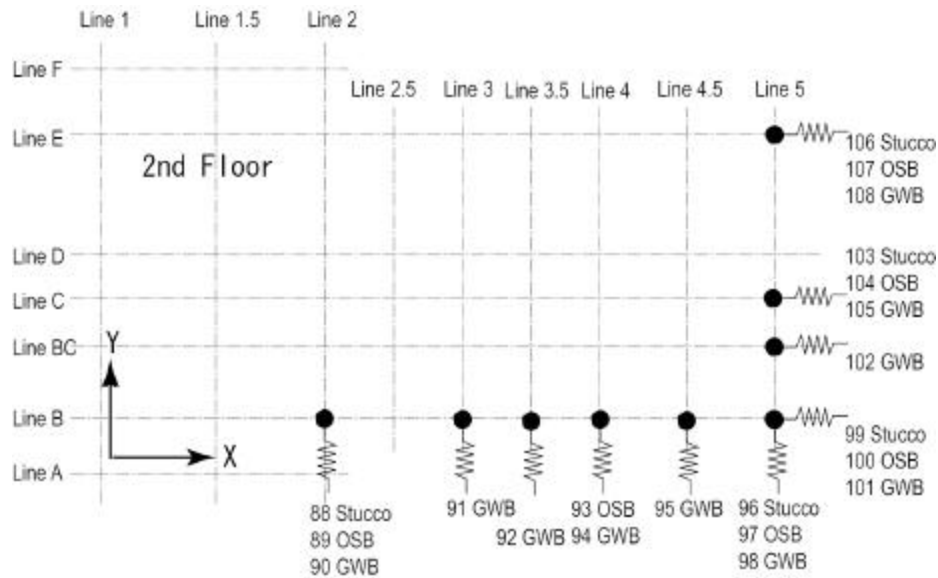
Locations, Orientation and Numbering of Shear Elements for Interior and Exterior Vertical Walls on the second floor of the Large-House Index Building.
